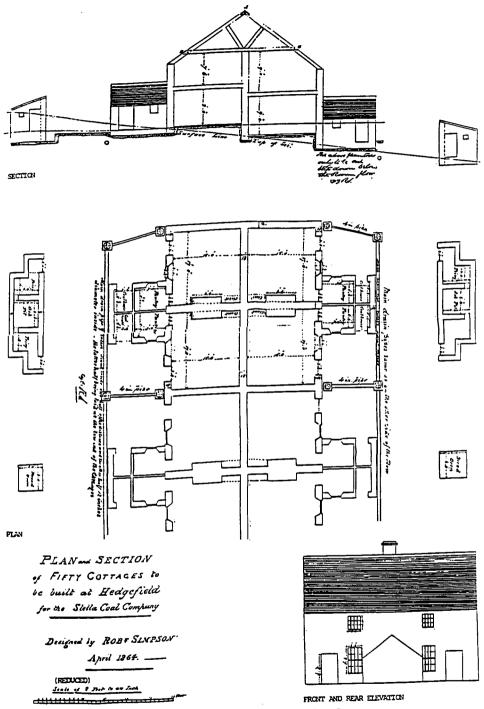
Two-roomed cottages, back to back: 1 ground-floor room, 1 first-floor room.
